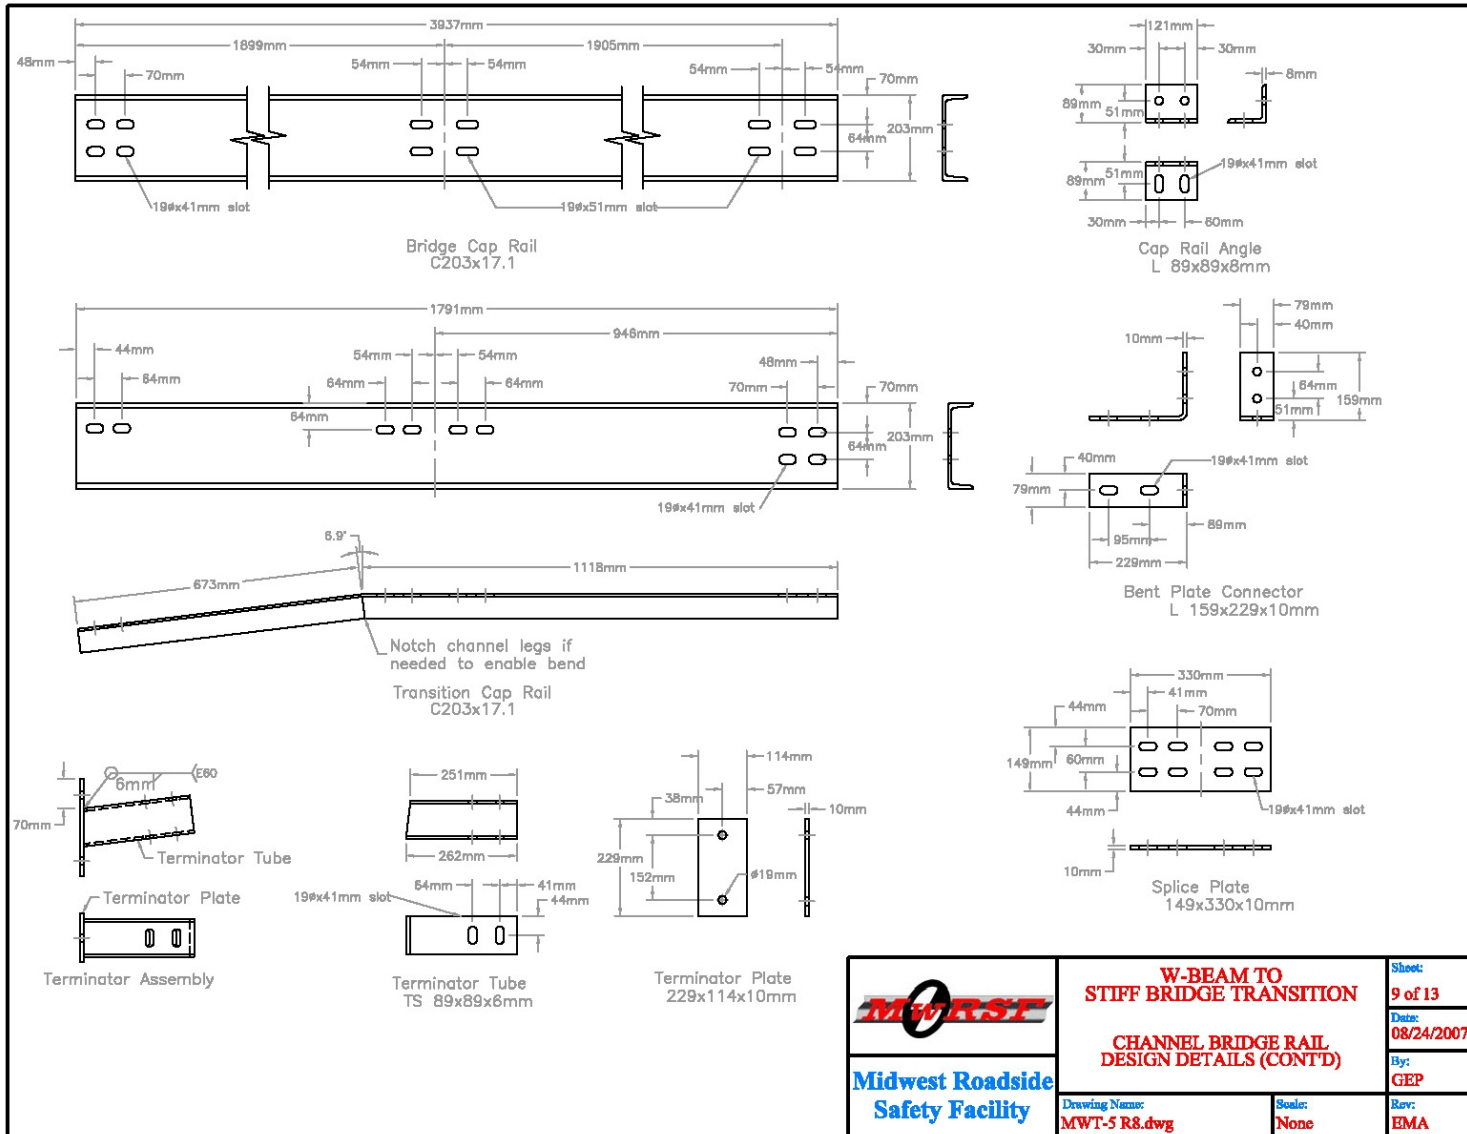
Channel Bridge Rail Design Details (Design No. 3)
